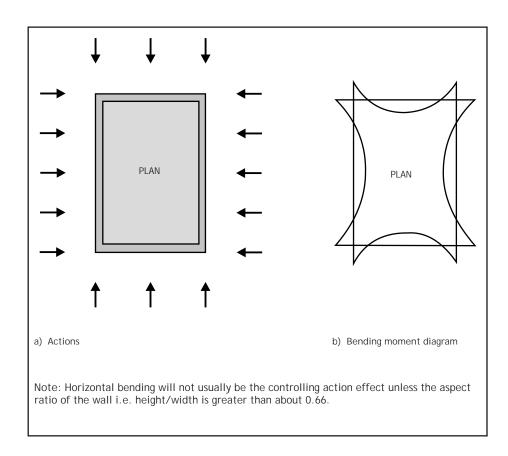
Plan section through a basement showing typical actions on and moments in walls.
